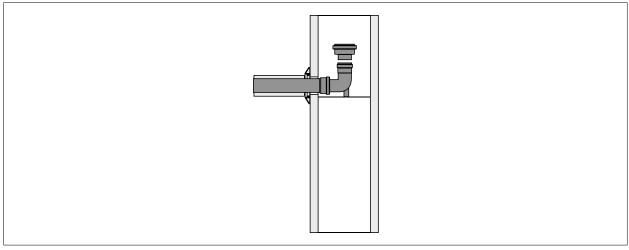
Enlargement for support bend from DN 110 to DN 160
